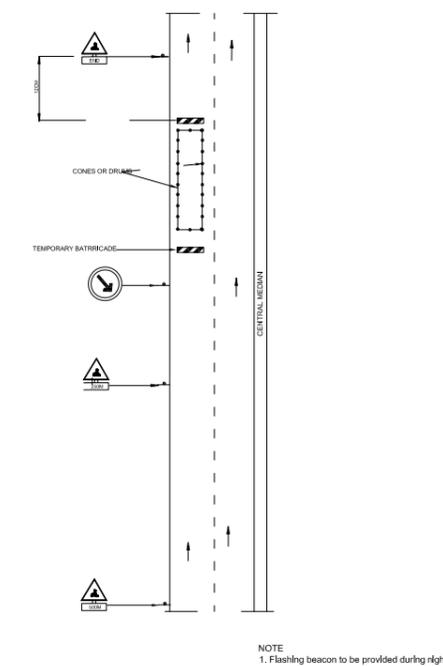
Layout of Signs For Work Zone in One Lane of 4 Lane Dual carriageway
